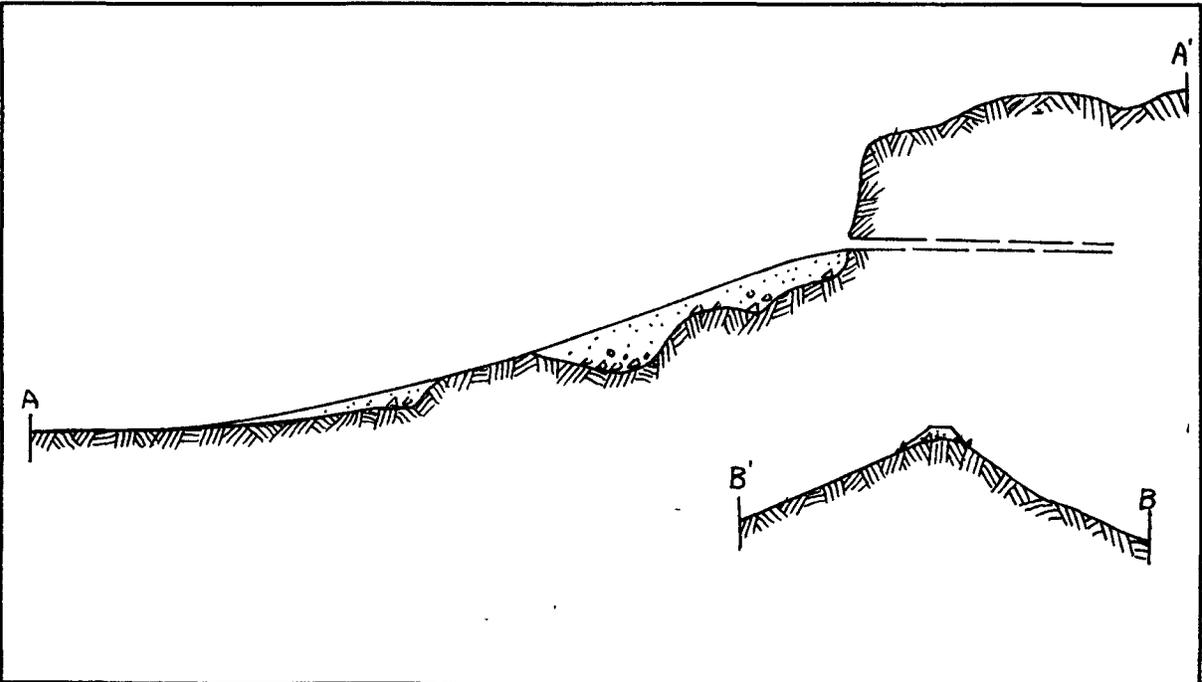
Vertical sections of proposed entrance ramp and tunnel.
